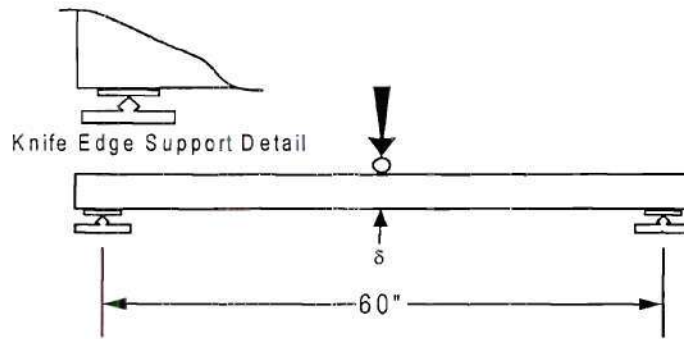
Elevation of 4.25-inch specimen test set-up
